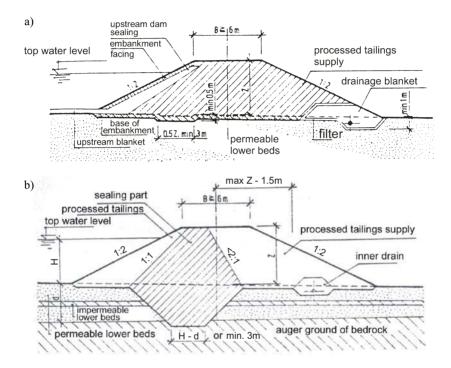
Non-homogenous dam on: a) permeable lower beds (foundation alteration); b) permeable lower beds
